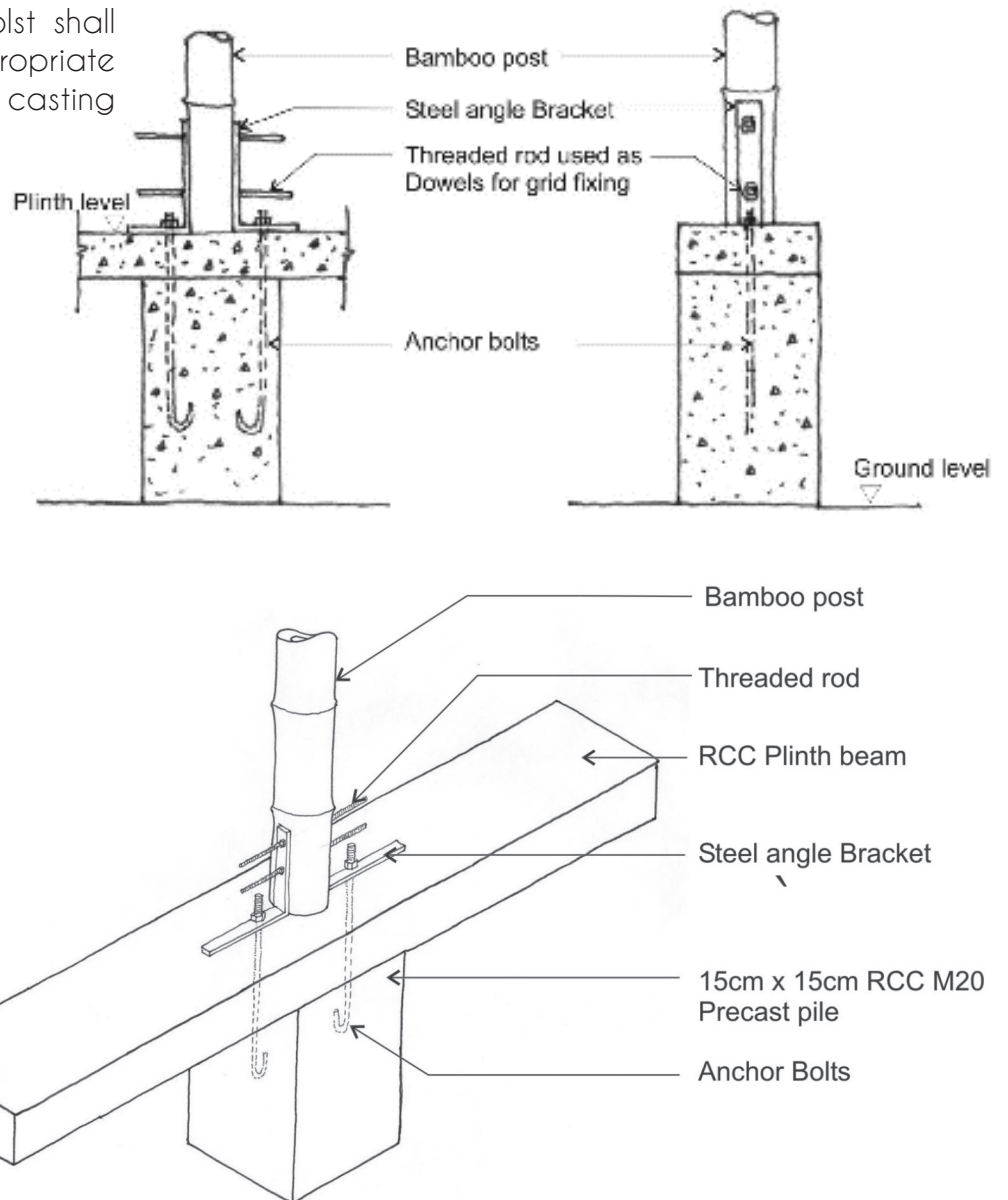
Fixing detail of bamboo to plinth using bolted connection
